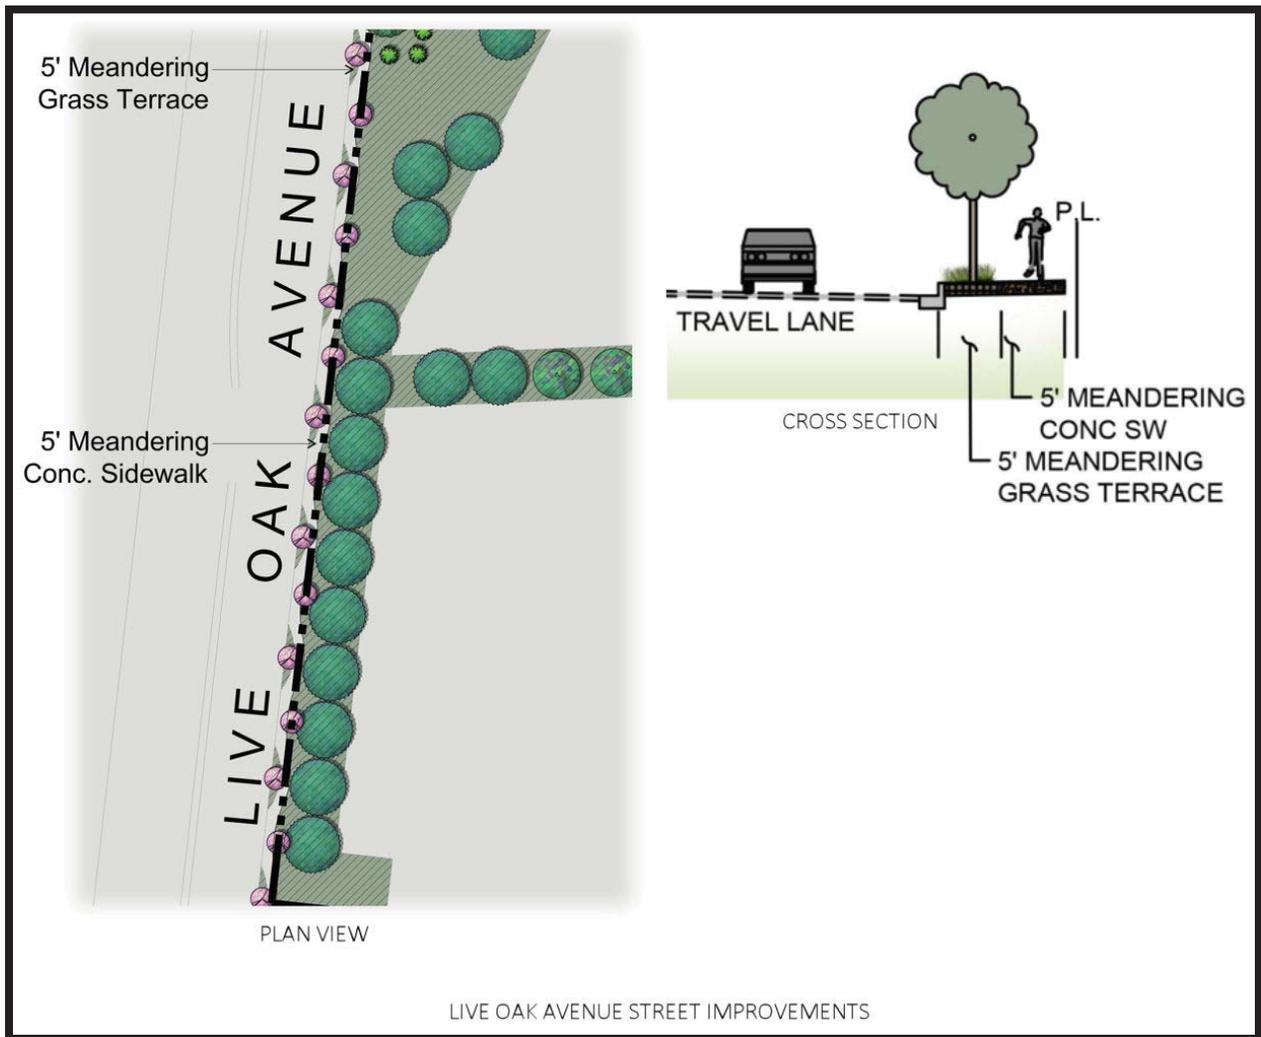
STREET IMPROVEMENTS – LIVE OAK AVENUE
